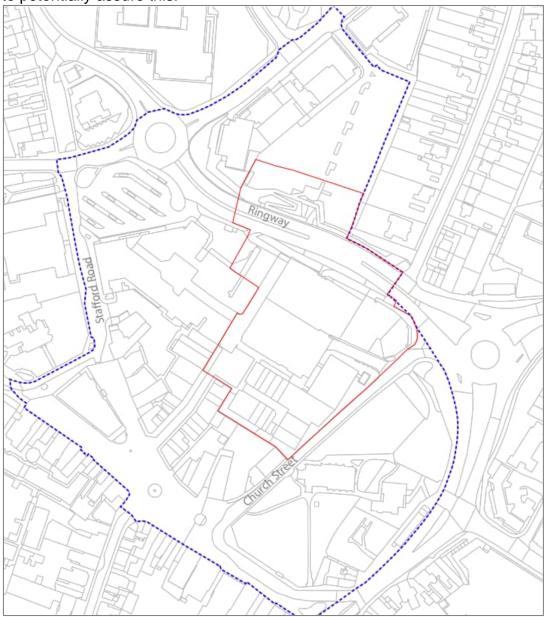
Extract from submitted Location Plan showing the extent of the site area in red, and the extent of the Levelling Up Fund Area in blue.
